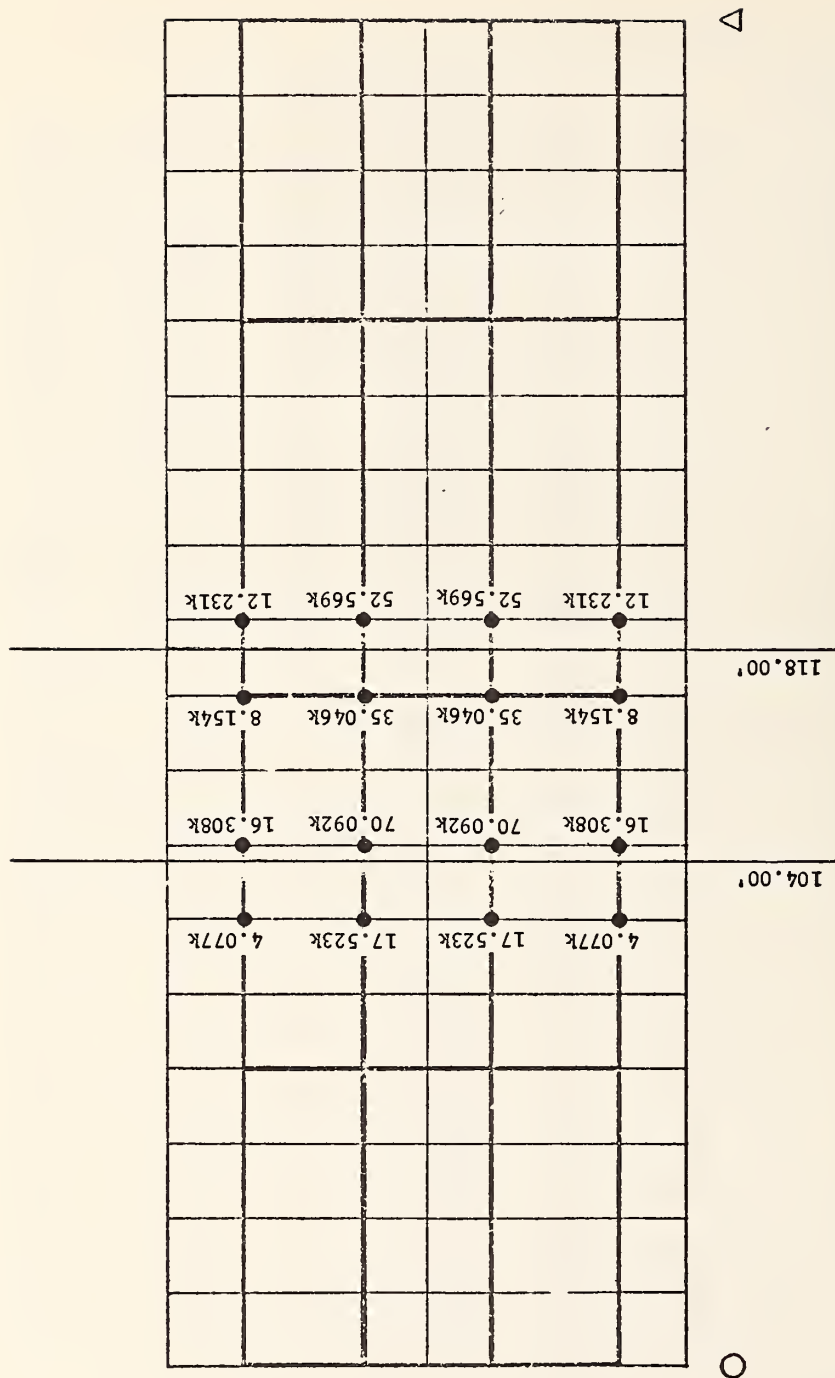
LOAD CONDITION 6, BRIDGE 1. STATIC LOADING.
